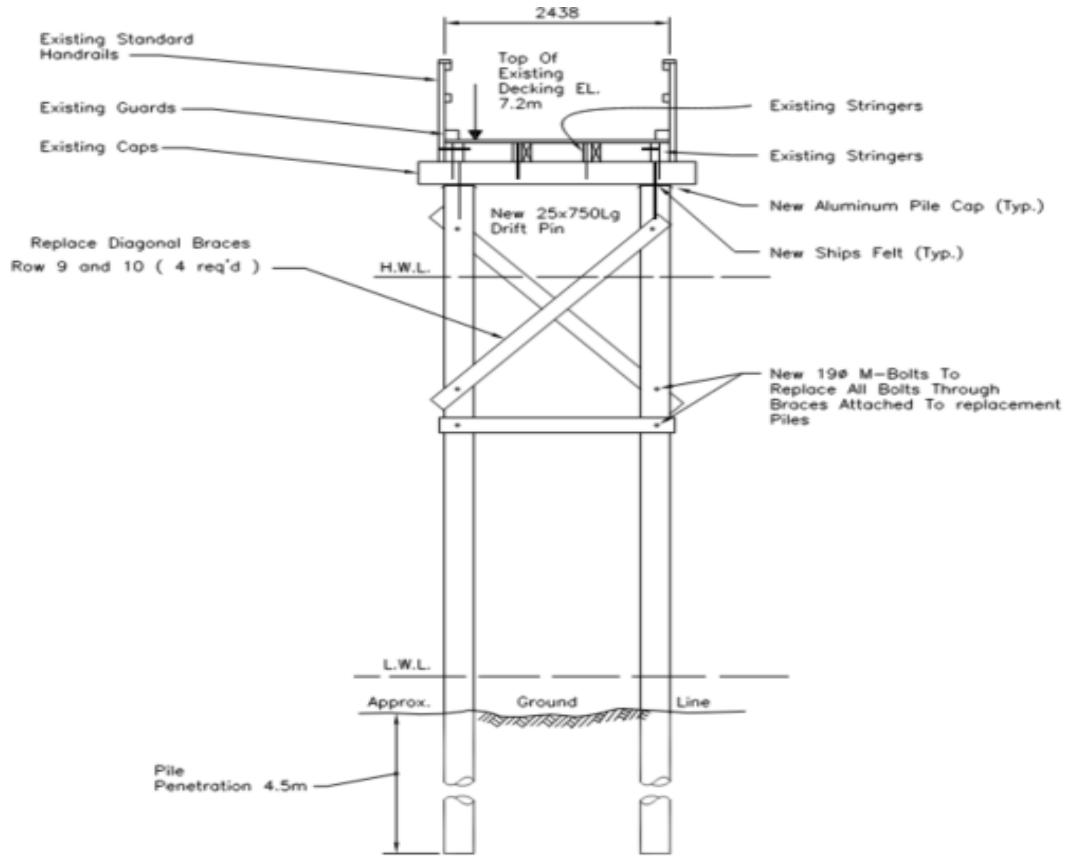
Typical Structure Cross Section (Abutment to Bent No. 13)
